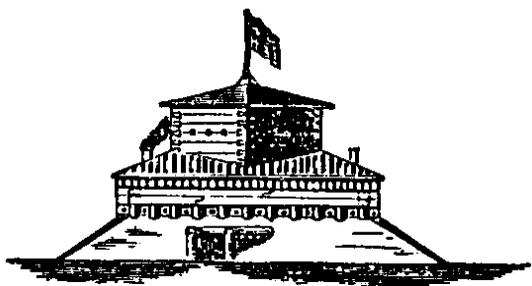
ELEVATION OF RECTANGULAR BLOCK-HOUSE.
